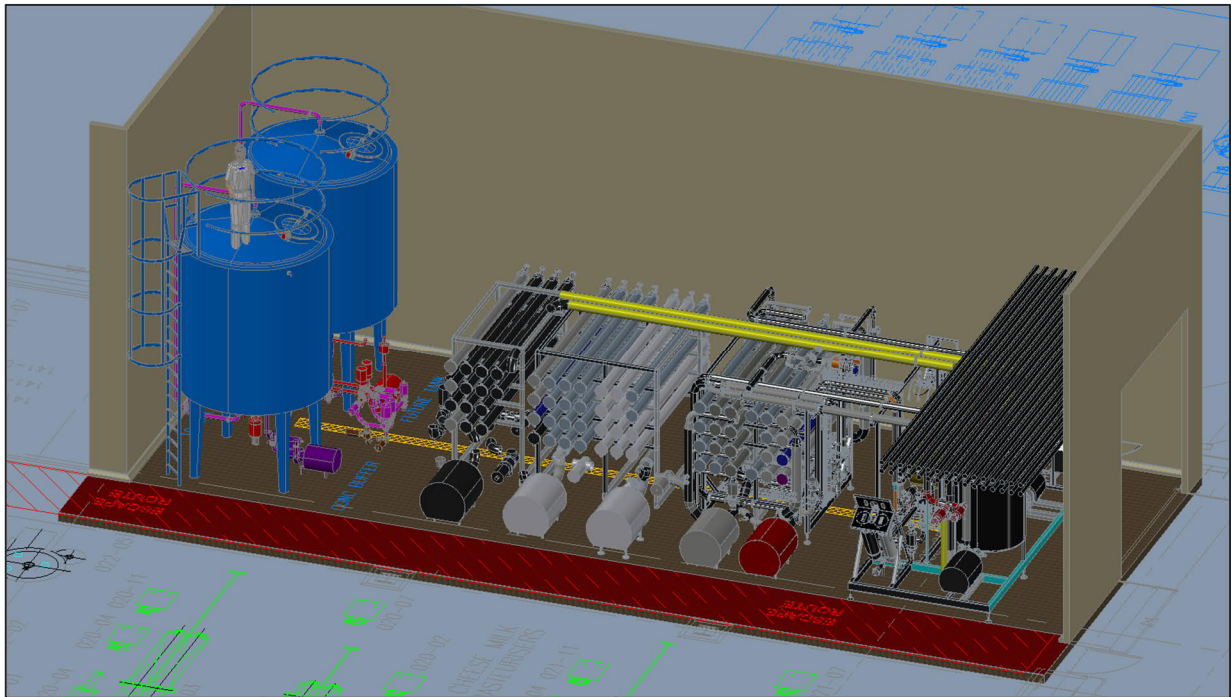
Milk Protein Standardisation Equipment Layout (2)
